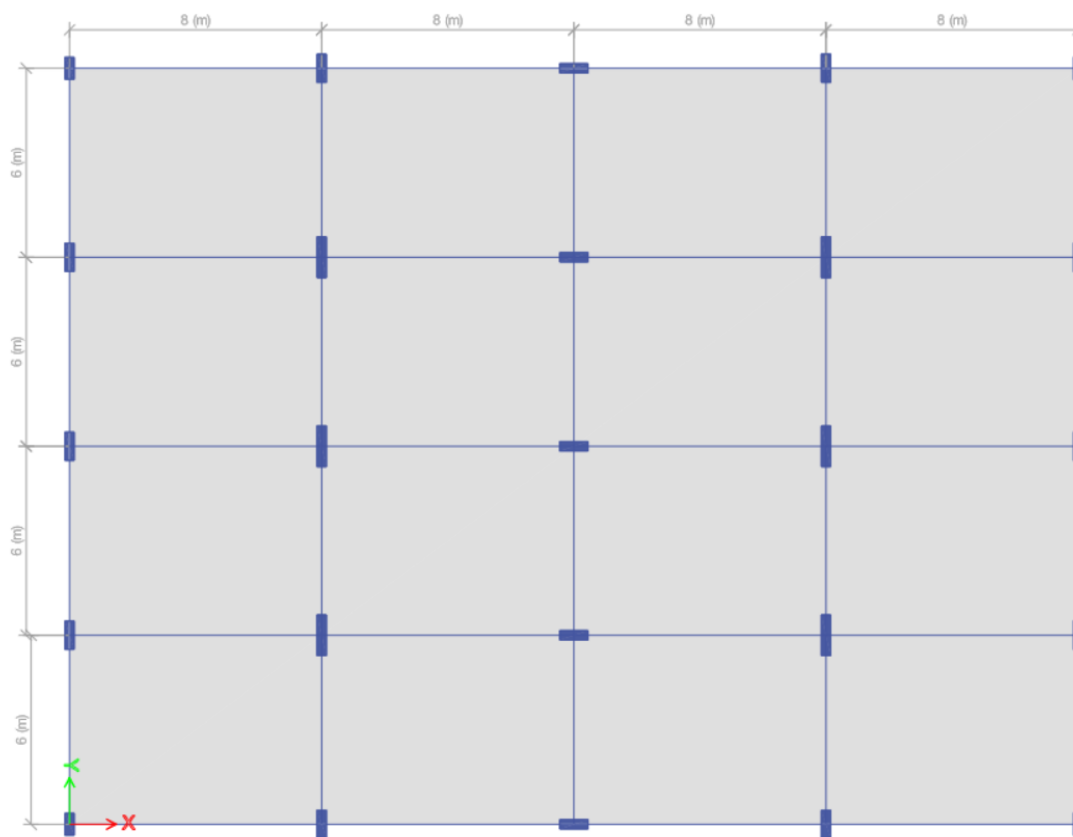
Moment Resisting Frame - Lateral Load System for Group 1
